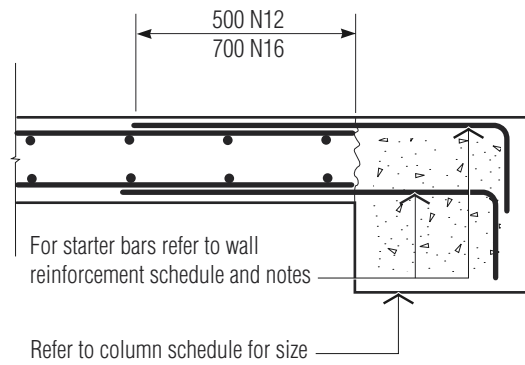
This figure shows the connection between a column and a wall in plan. Usually the column is poured first and either starter bars or cast-in ferrules with screw-in bars which are then used to connect the column to the wall which is poured later.
